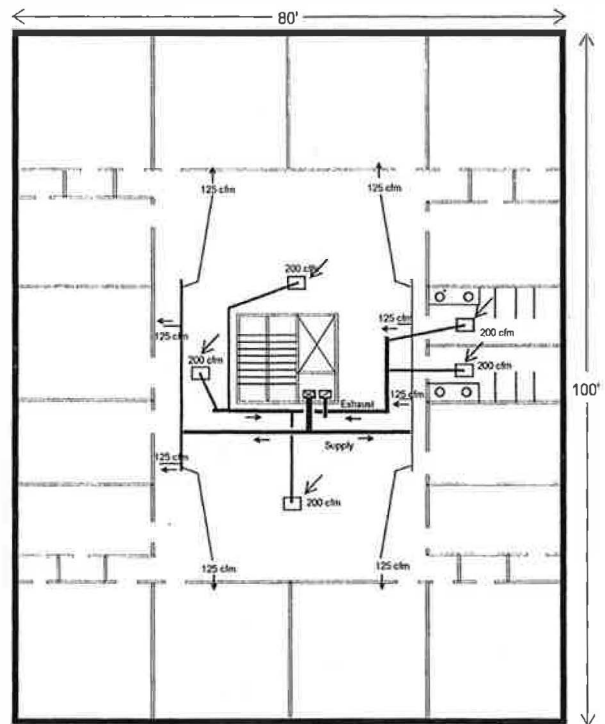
Ventilation air ductwork for one floor of a four-story office building.
